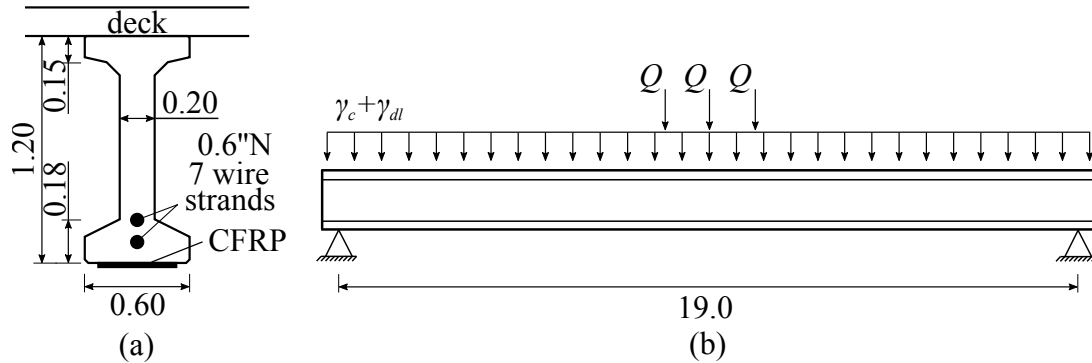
Case study: (a) transversal section; and (b) longitudinal section and loading (m).
